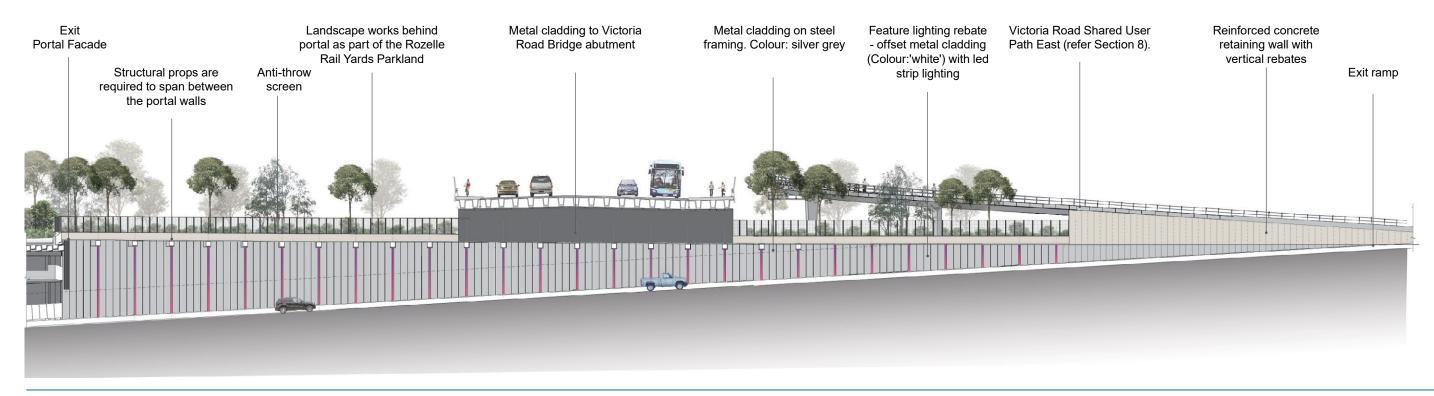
M4-Anzac Exit Portal - North dive wall elevation
